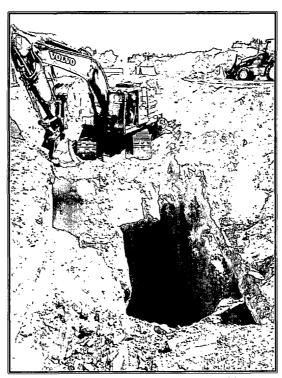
Final excavation depth of the Lateral C-7 Pipeline at 33.5' below ground surface along County Road 7007.
